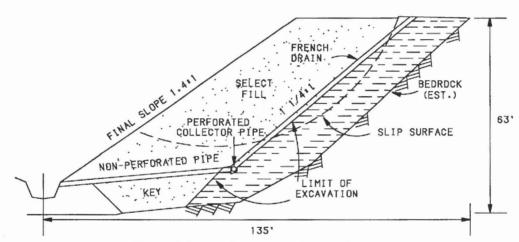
Cross-section at MP 13.5, detailing slide repair.
